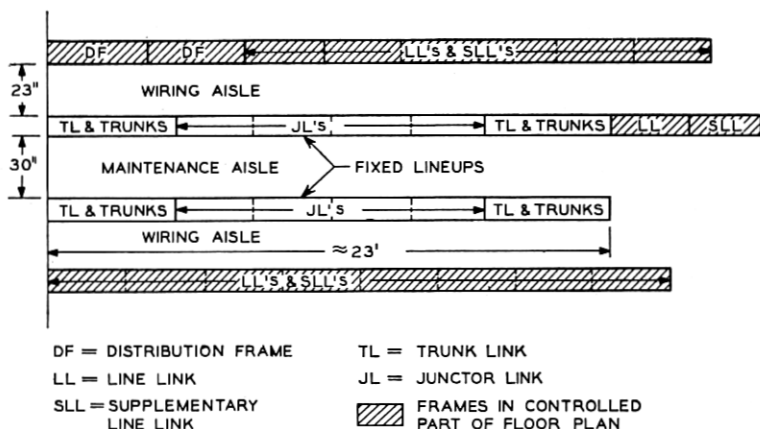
No. 5 crossbar wideband (WB) switching area typical floor plan.
